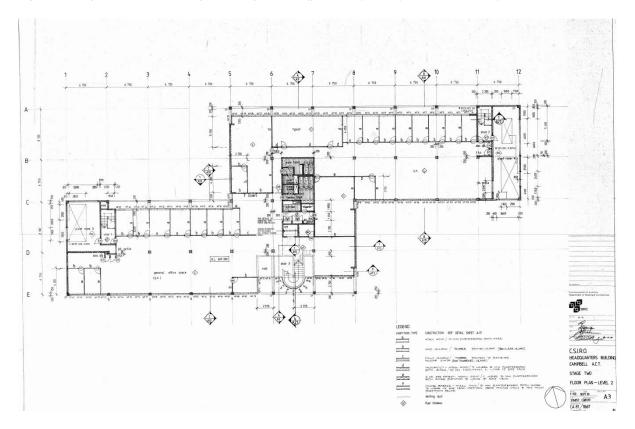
Original architectural drawings of Building 3, Level 2, 1981. (Source: DOMA Group)
